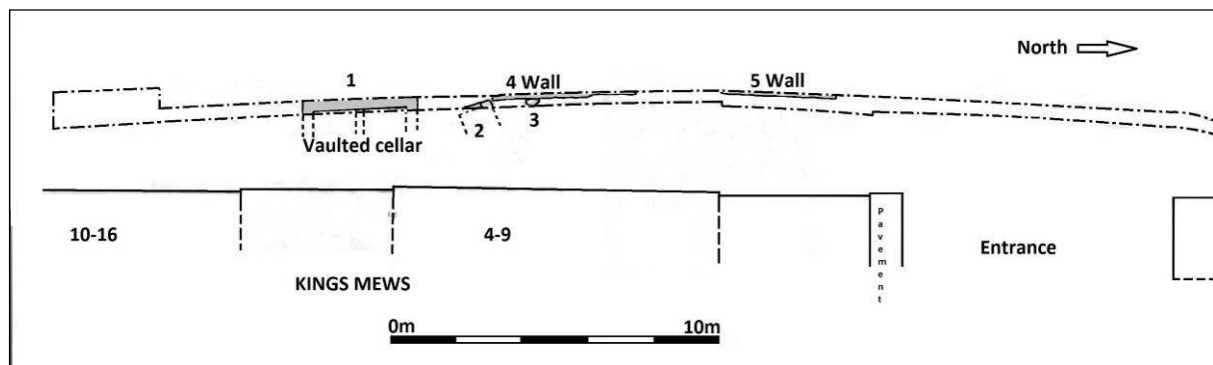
A Plan of Features 1-5 at the South End of Eastgate
